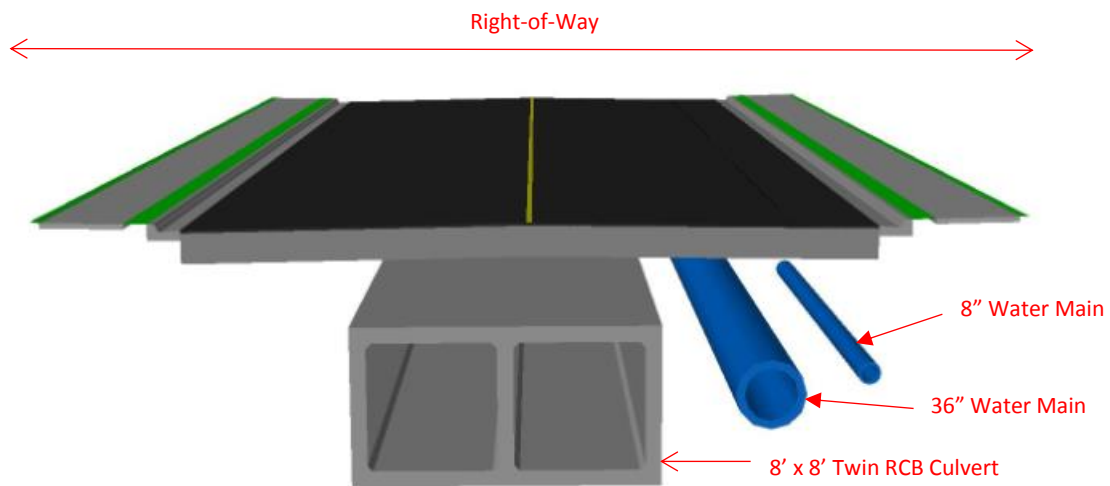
3D Rendering of Cass Street Typical Section (NTS)
